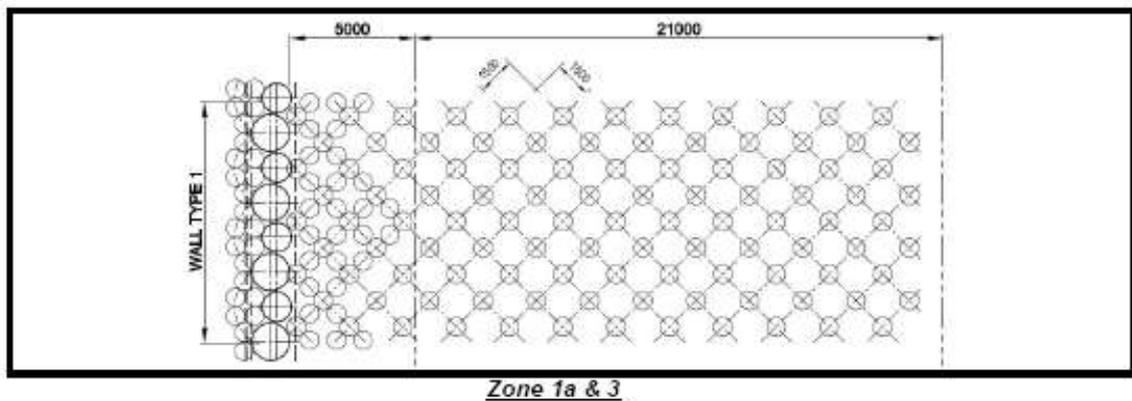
Plan showing layout of pile wall, SMC's and soil berm
